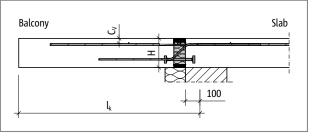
Schöck Isokorb® T type K-M12: Static system
